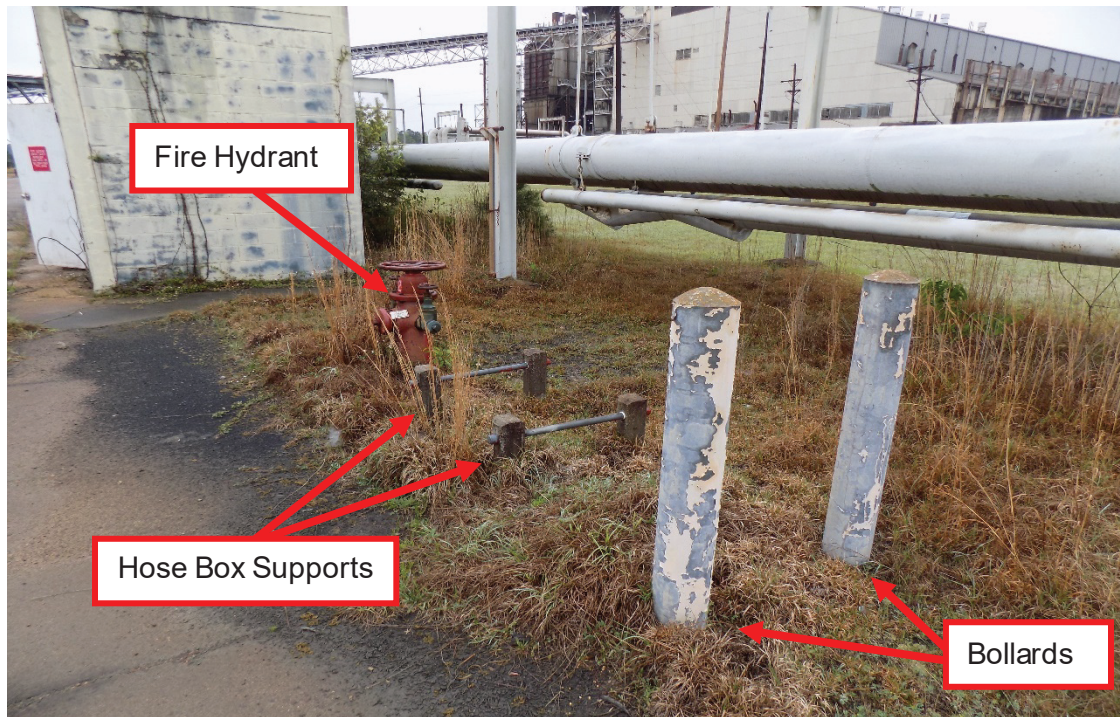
Building 484-9D Hydrant, Support Frame and Bollards
